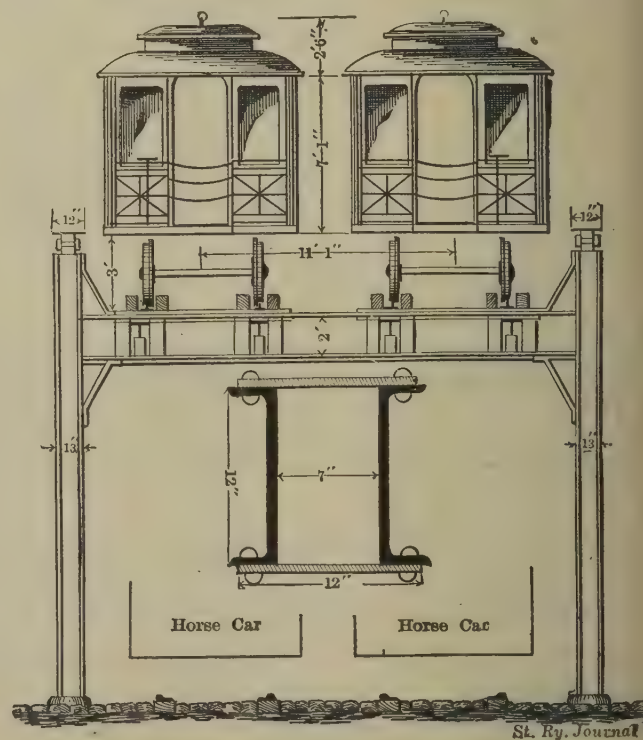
MANHATTAN ELEVATED—SIXTH AVENUE.
